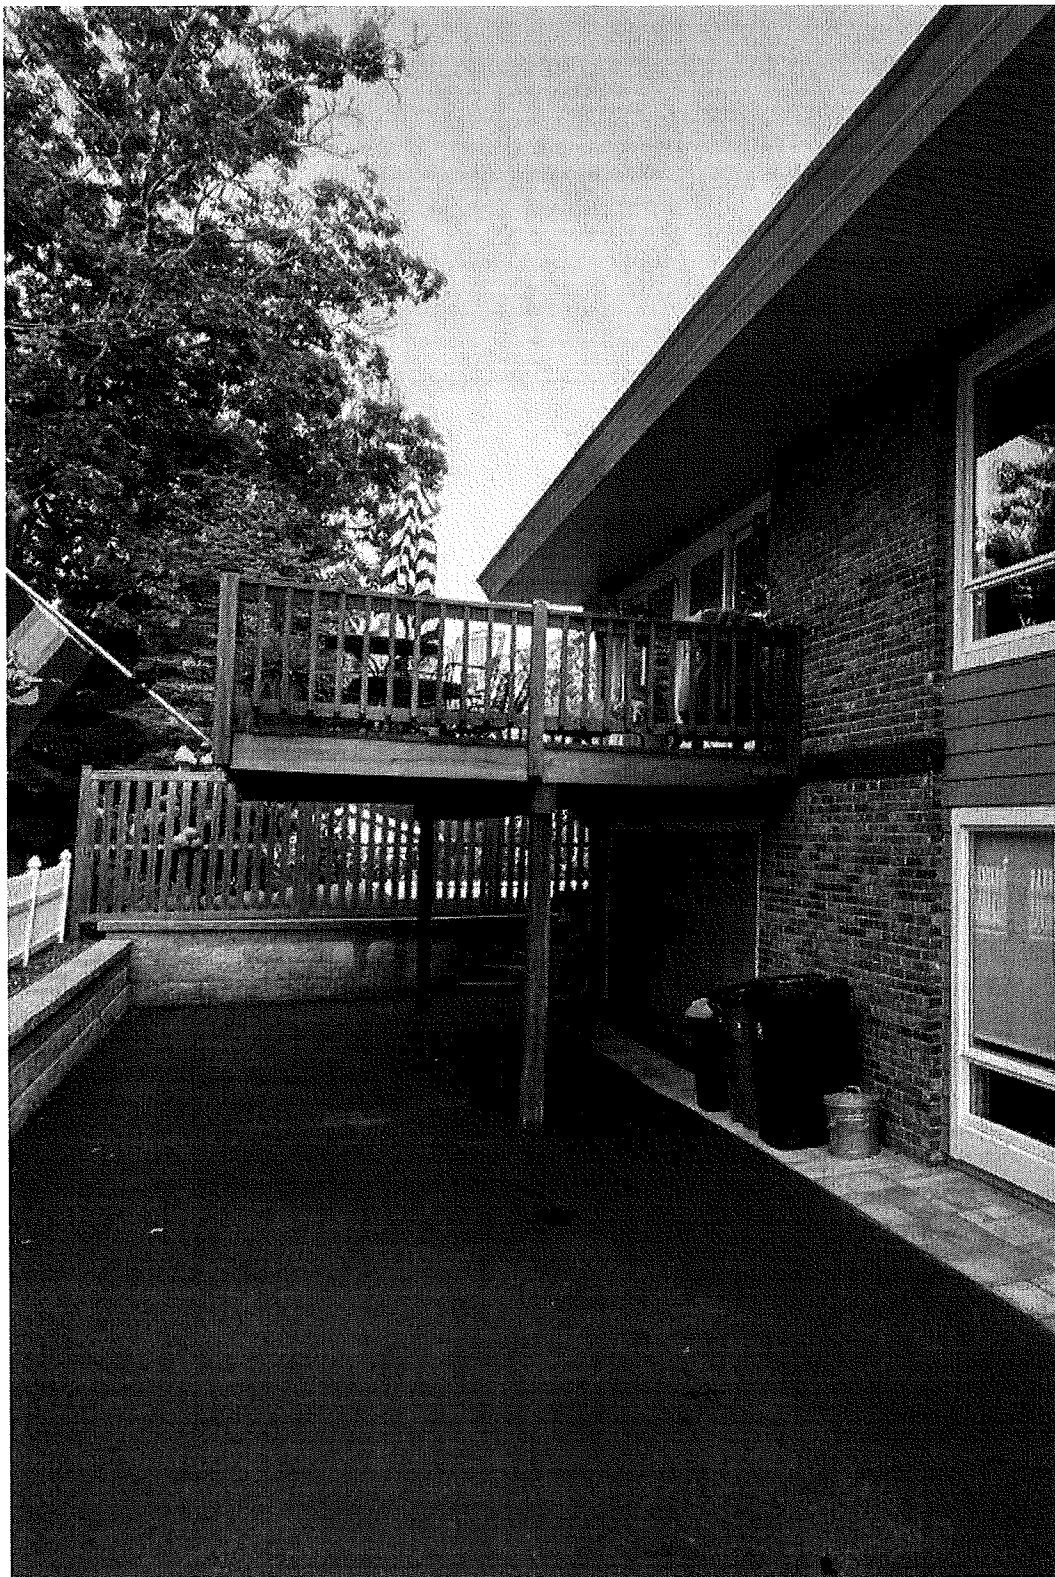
Picture of the deck and garage from the driveway 59 Lincoln Pkwy.
